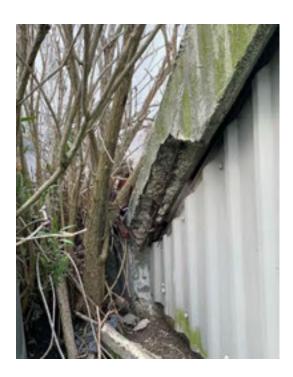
Severe concrete spalling and corroded steel reinforcing at existing support.
